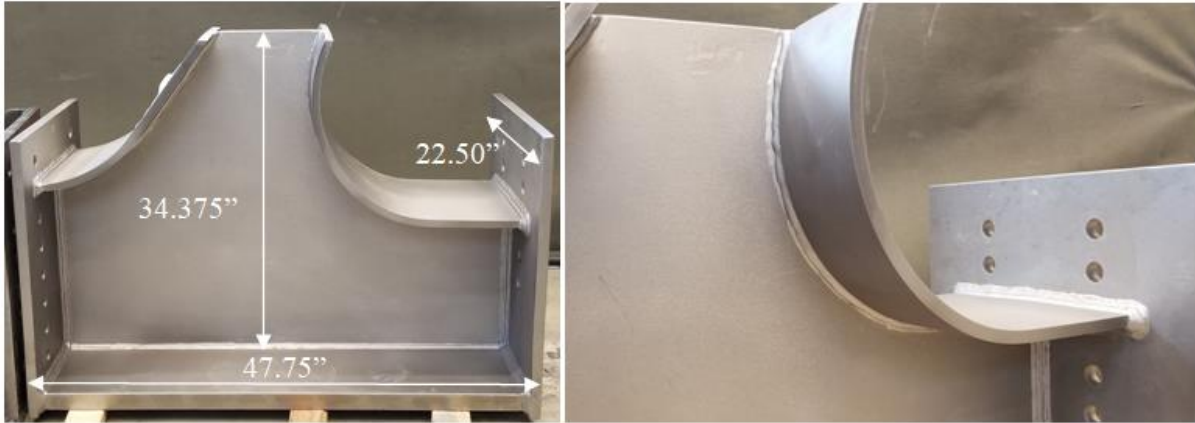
Fabricated Specimen of the Gusset-less Connection
